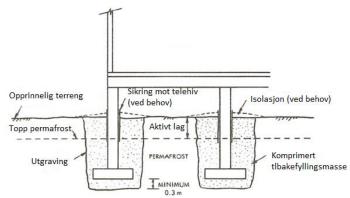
Shallow foundation on point or slab (Rognved et al., 2017).
